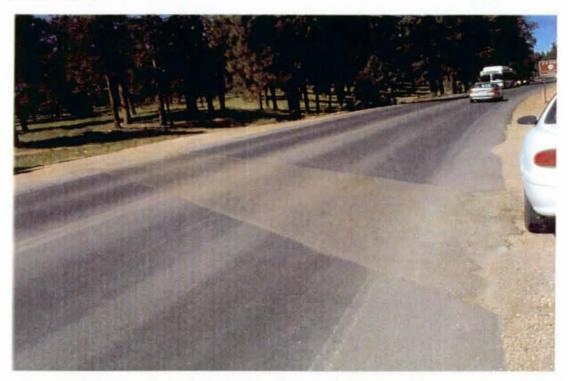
MP 6.82 - New culvert installation, Typical Pavement Section.
